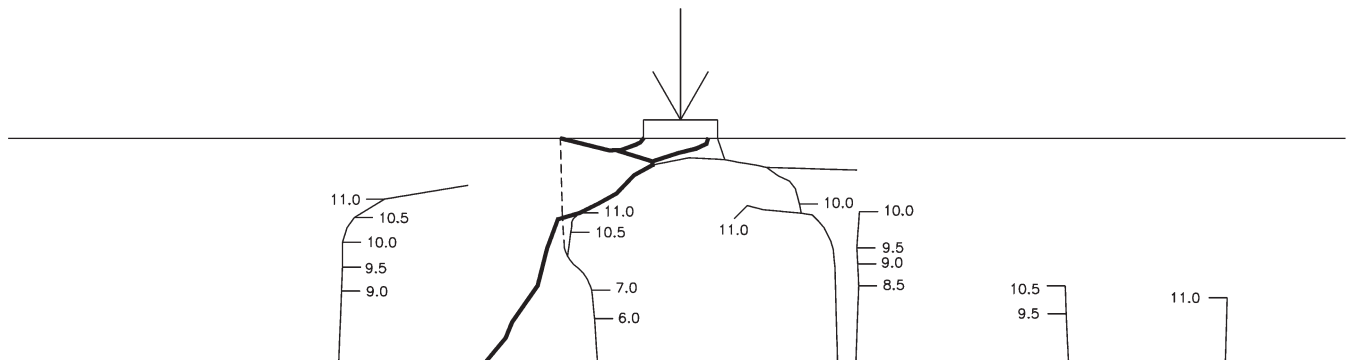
Crack patterns at failure of single-strand development length specimen 1L.
